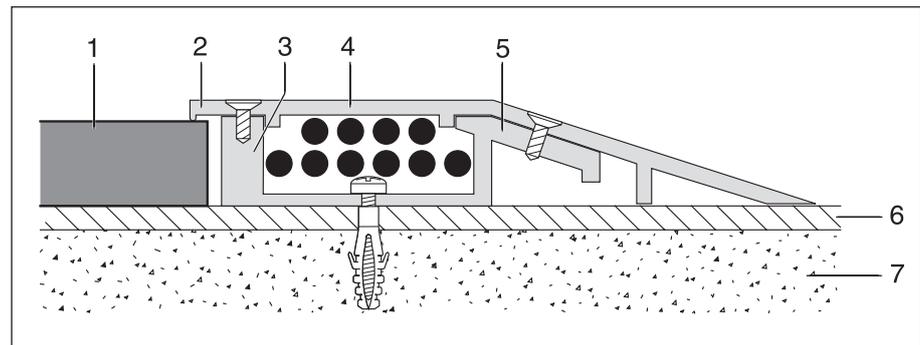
Installation cross-section for Ramp Edge AK 105
